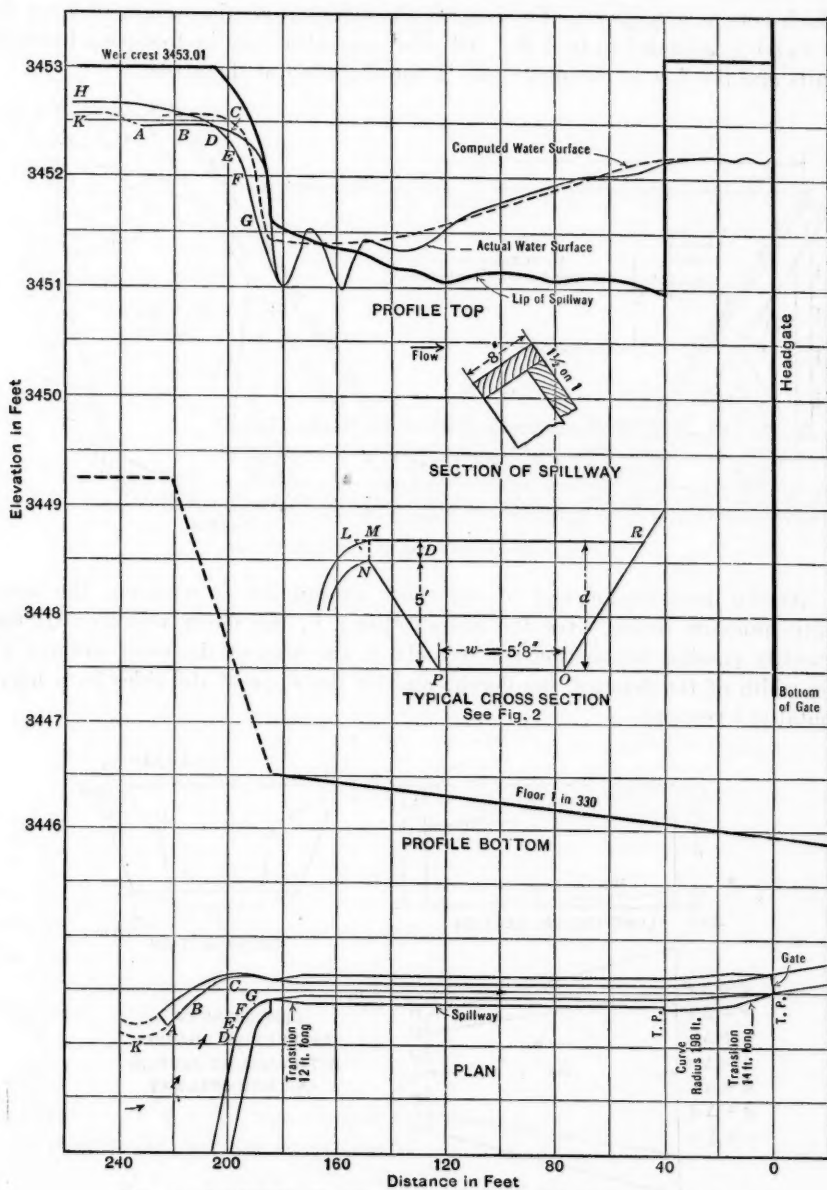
LIAWENEE FLUME EXPERIMENT NO. 19, GENERAL PLAN.
